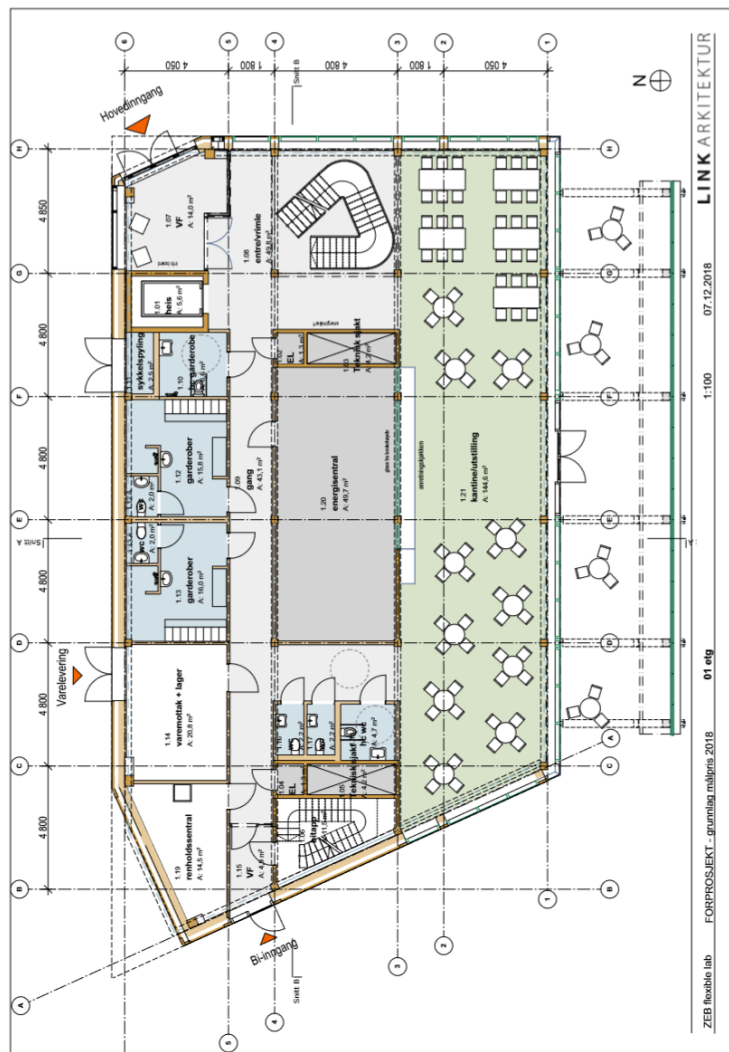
Floor plan of the first floor of ZEB Laboratory.
